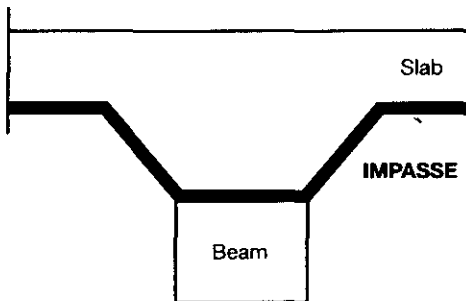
Shows Impasse Barrier installed between the slab panel and internal beam of a non-monolithic slab.
